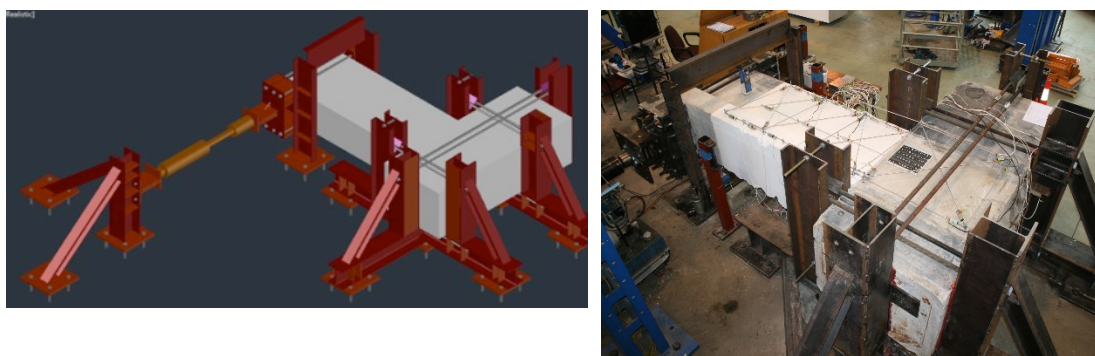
Experimental campaign on the extracted superassemblages (portions of the PWC building): test set-up, epoxy repairing intervention
